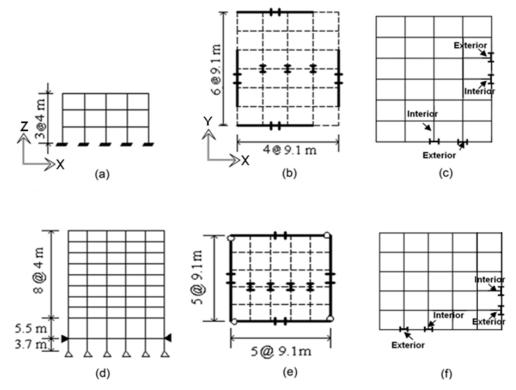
(a) and (b) elevation and plan for Model 1; (d) and (e) elevation and plan for Model 2; (c) and (f) studied elements for Models 1 and 2
